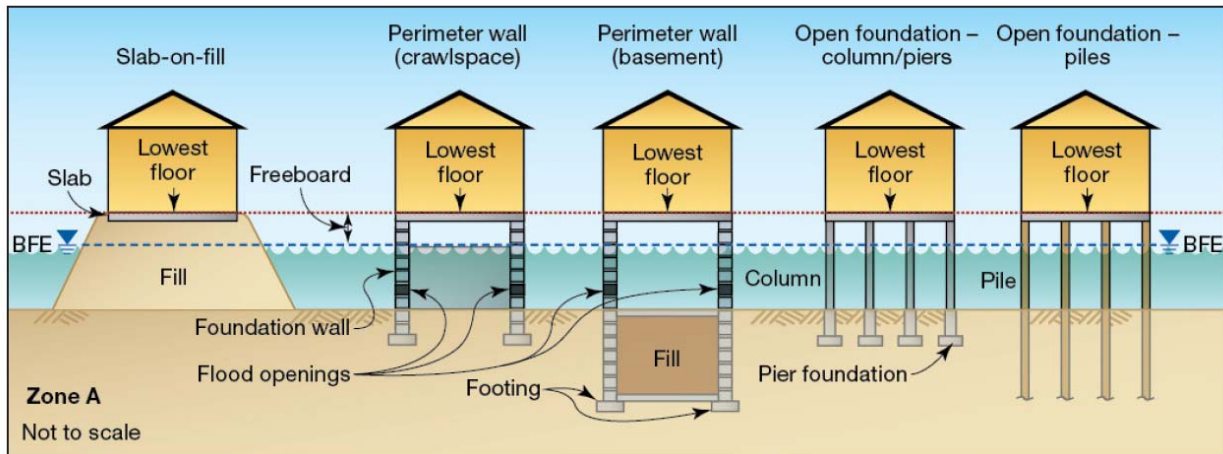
Recommended foundation types for Zone A. (Source: FEMA Hurricane Sandy Fact Sheet 2)
